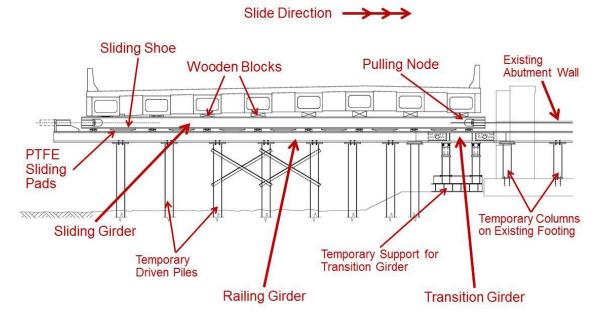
Section through the deck of the new superstructure on temporary structure
